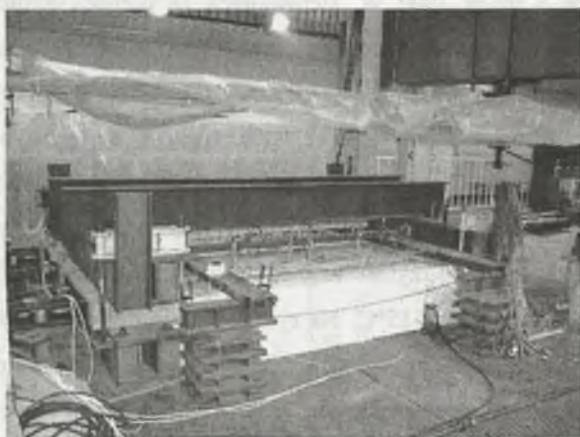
The view of unreinforced joint in precast concrete tank prestressed with internal tendons
